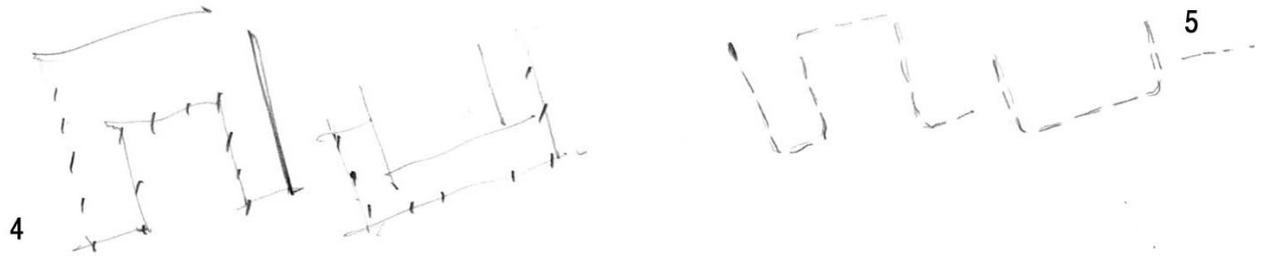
LEFT: South eastern facade facing the sea (SH in-situ).
